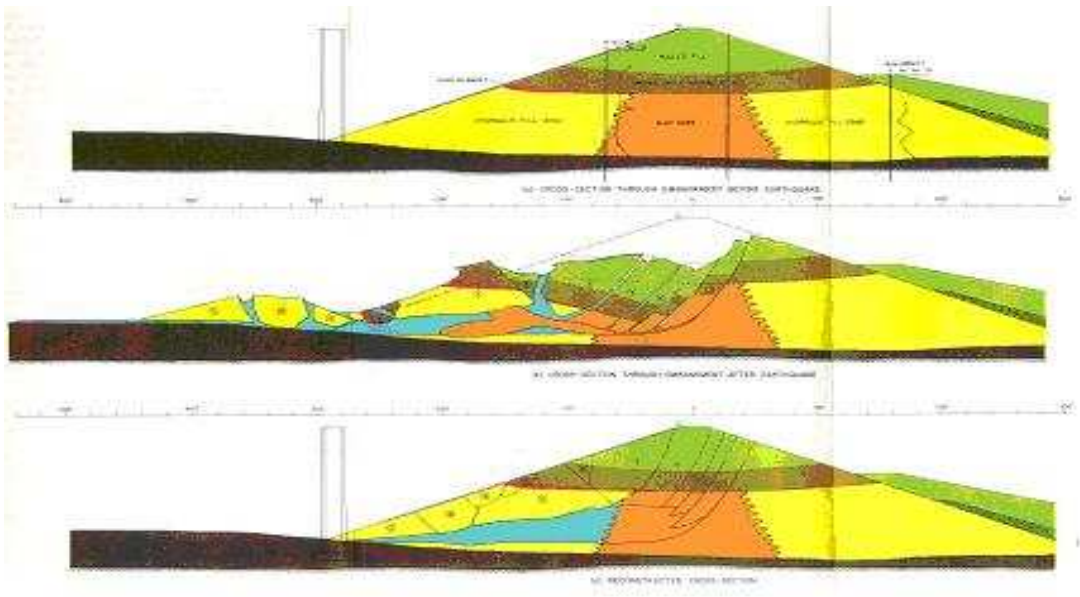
Cross-section of the lower San Fernando Dam through slide area and reconstructed cross section (after Reference [3]).
